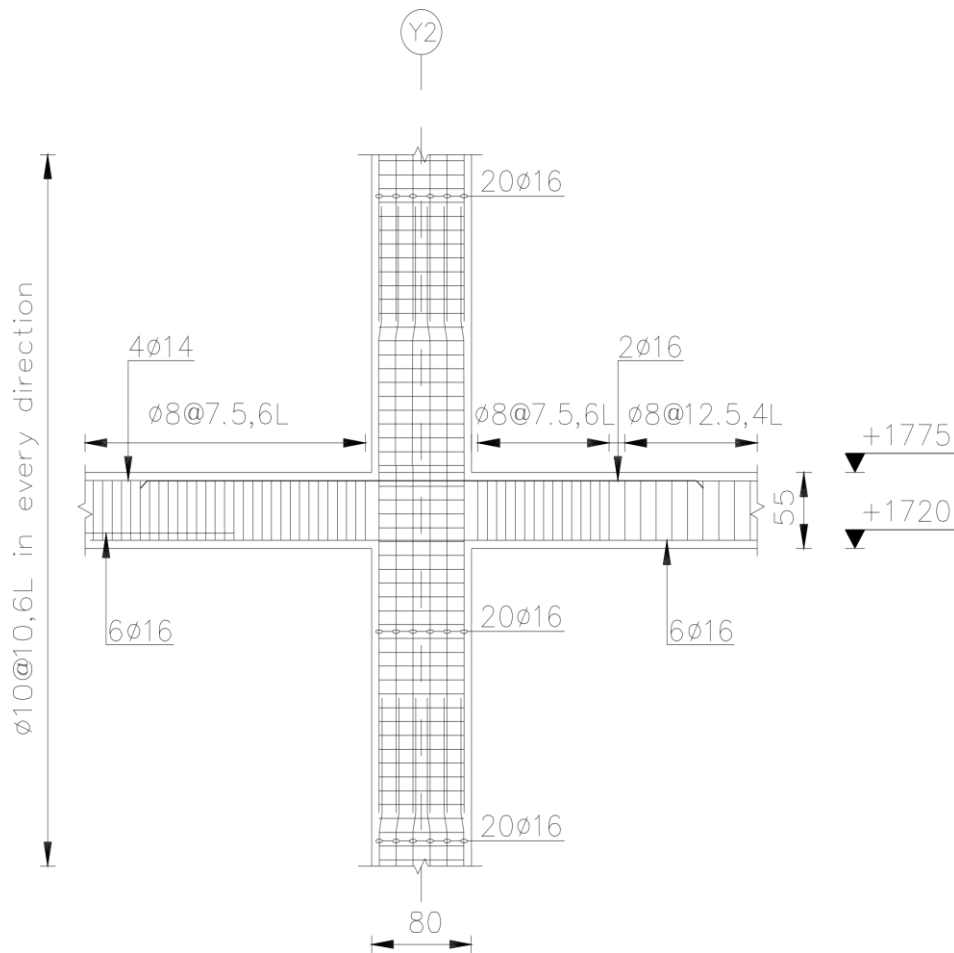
Reinforcement details (in centimeters) of the beam-column joint
